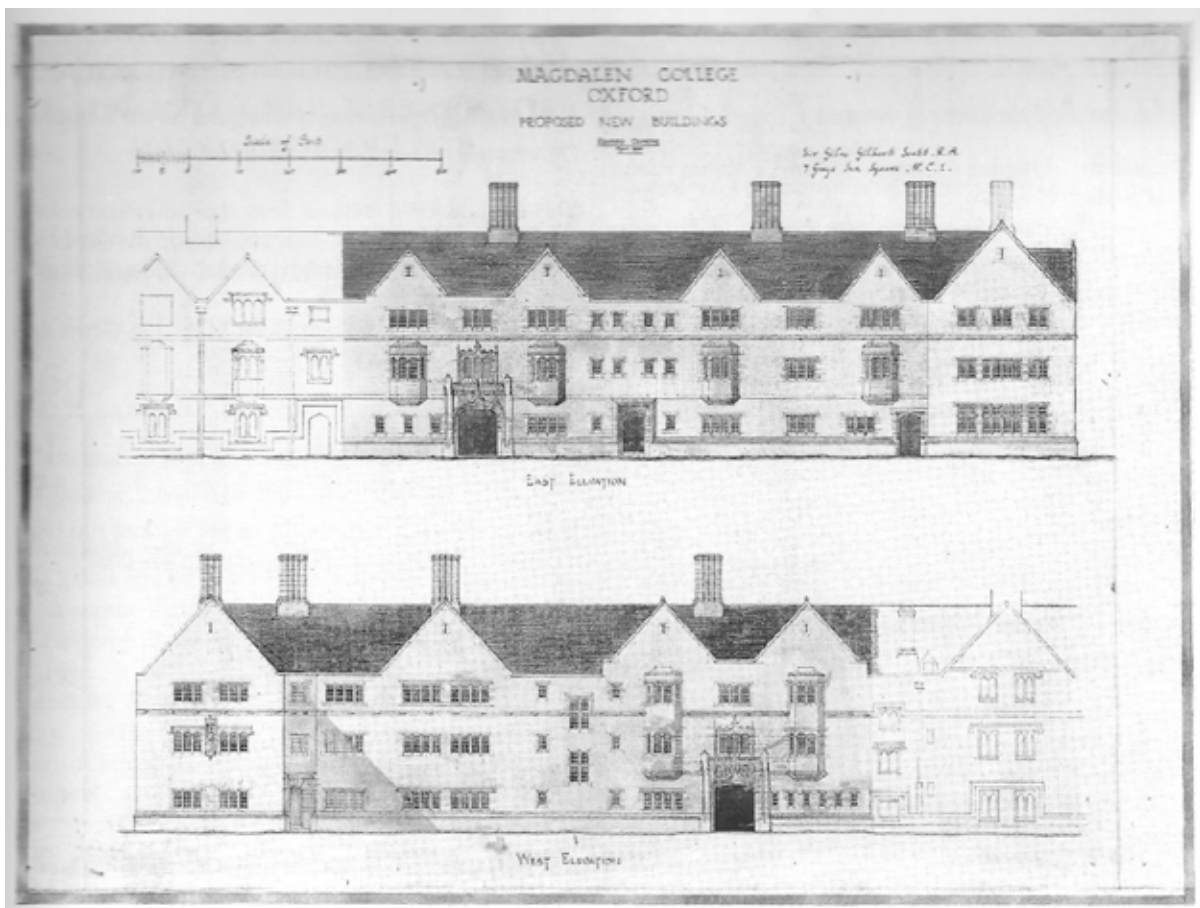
Elevations of Longwall Quad, Magdalen College. Magdalen College Archives.
